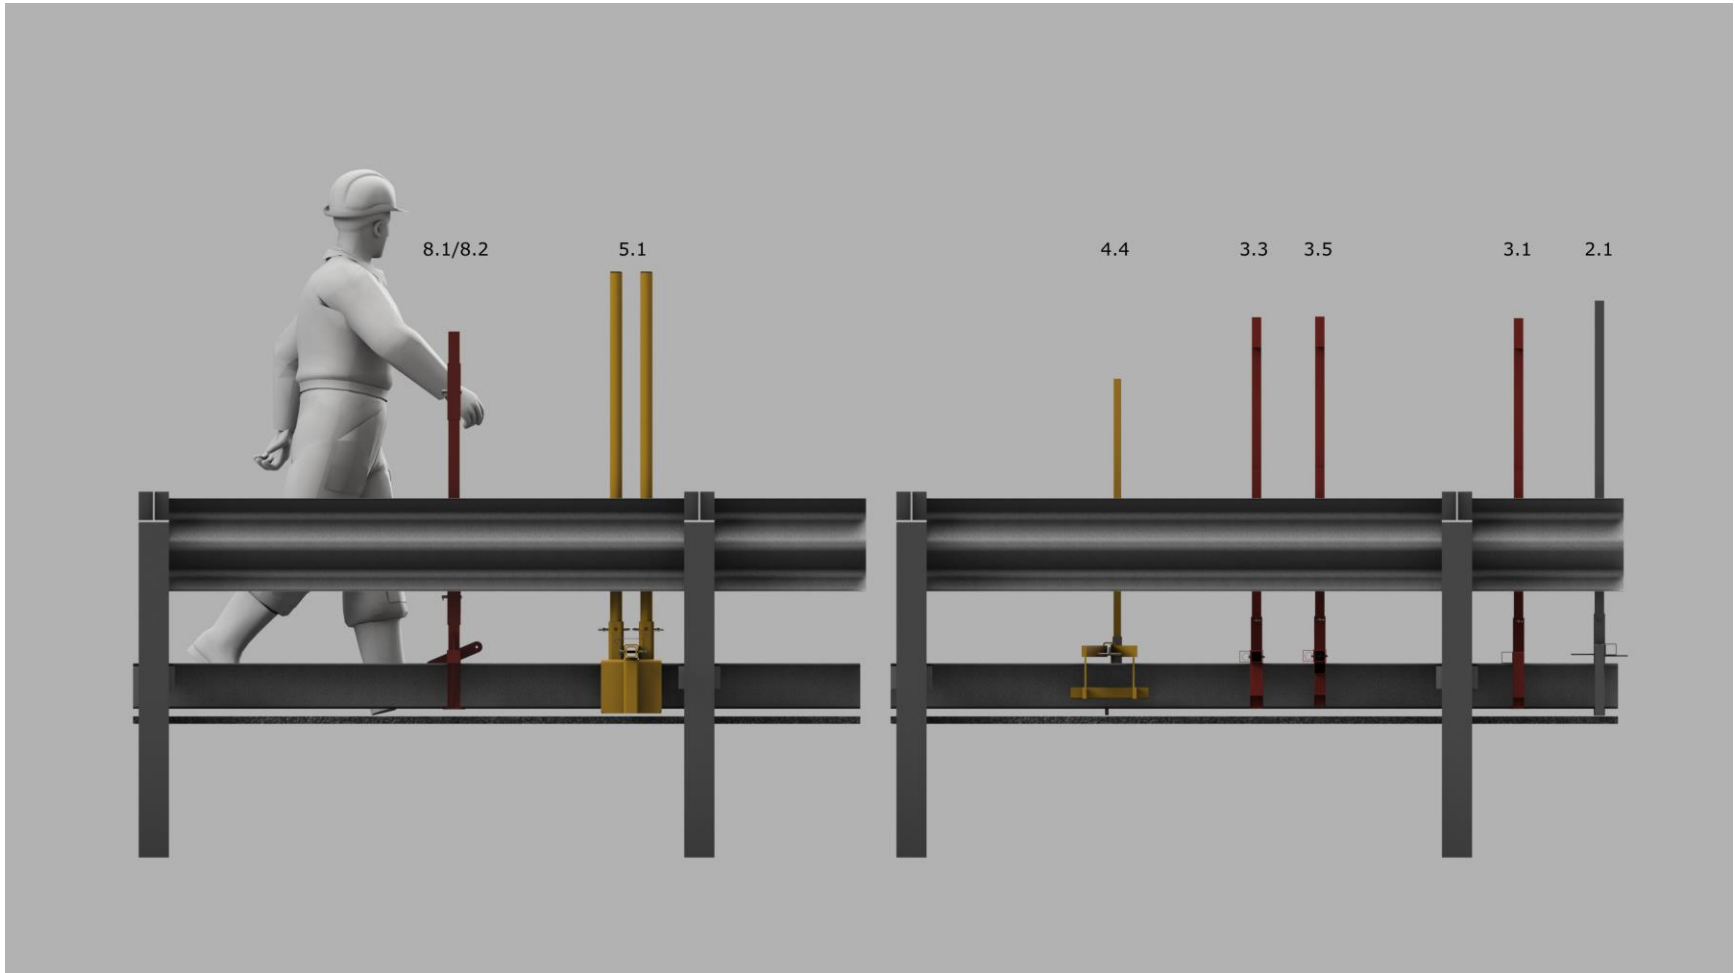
Guardrail Type 23, wheel guard fit; view from the west
